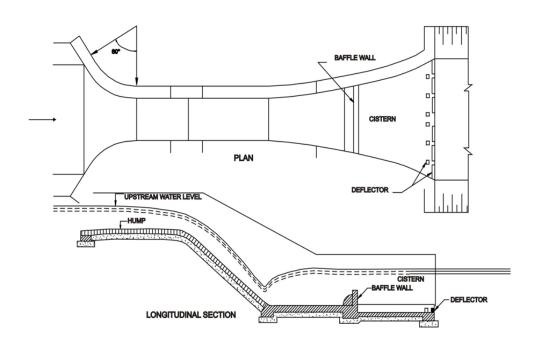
PLAN AND SECTION OH STANDING WAVE FLUME- FALL
